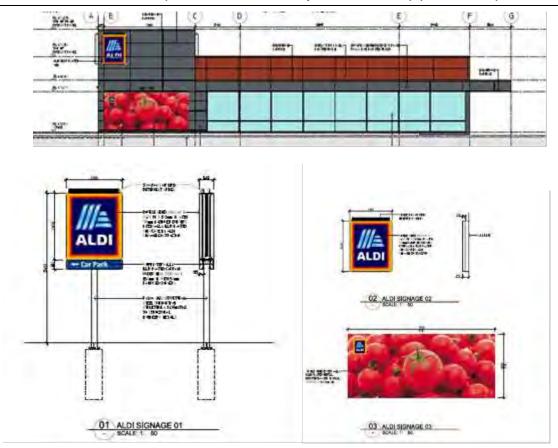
Proposed Signage (Source: BuiltConsult Pty Ltd.)
